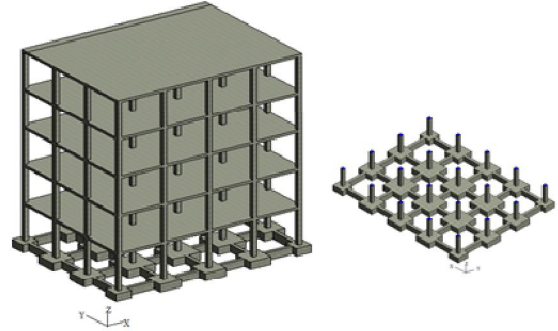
3D Model for the Proposed Structure and the System of footings with tie beams
